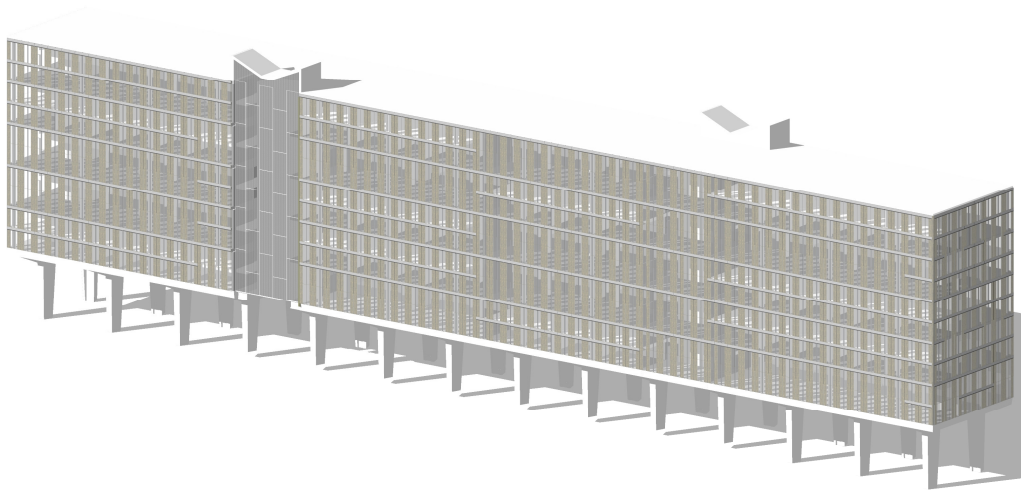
Impressions of possible façade design according to proposed façade concept
